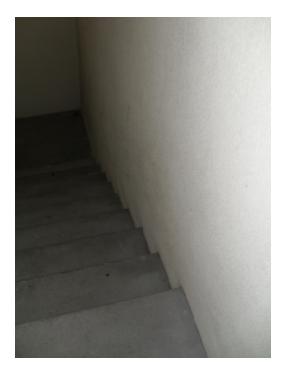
Outline of 'grey' steps against white/ cream wall - note absence of handrail
